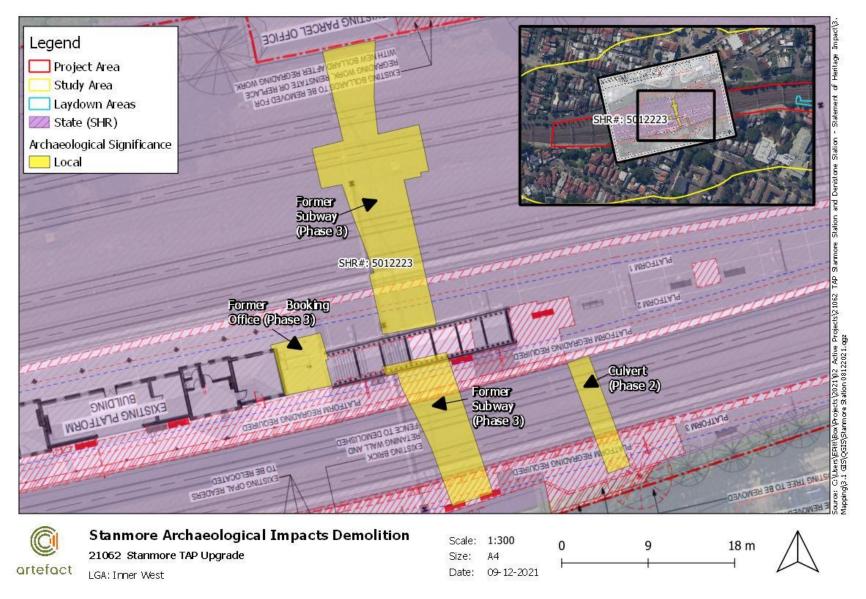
Plan of the proposed demolition works at Stanmore Station, detailing the areas of archaeological potential (Source: Artefact, 2021)
